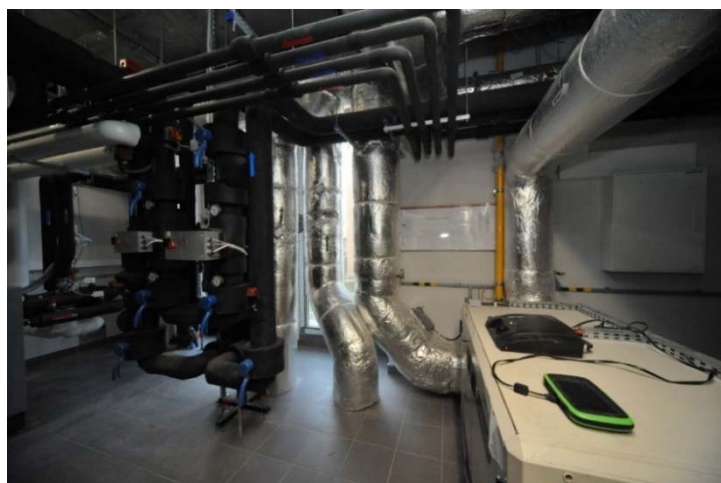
Mechanical room of the MLBE: ventilation unit and air channels covered with a shiny aluminium cladding; from the left: air wall intake (invisible, behind black water pipes), two ground heat exchangers' outlets passing through the floor, intake manifold, and exhaust).
